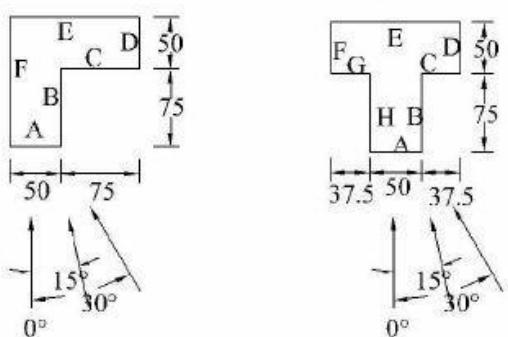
Isometric view of Building model of L-shaped building & T-shaped building respectively (J.A. Amin, A.K Ahuja, 2008)
